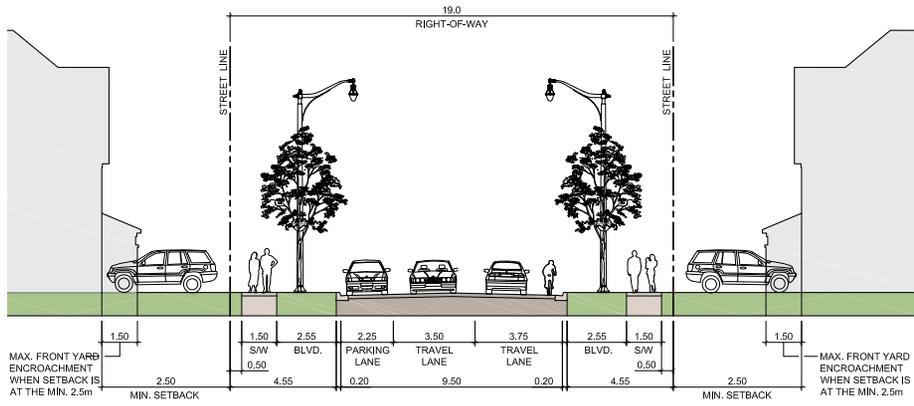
Collector Road - 19.0m R.O.W. / 2 travel lanes / on-street parking on one side / 4.55m boulevard.
